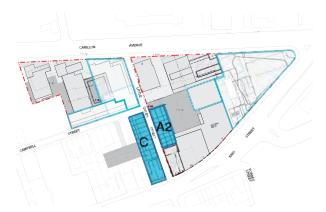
Stage 3 - Refurbish & upgrade Little Queen Street Terraces
